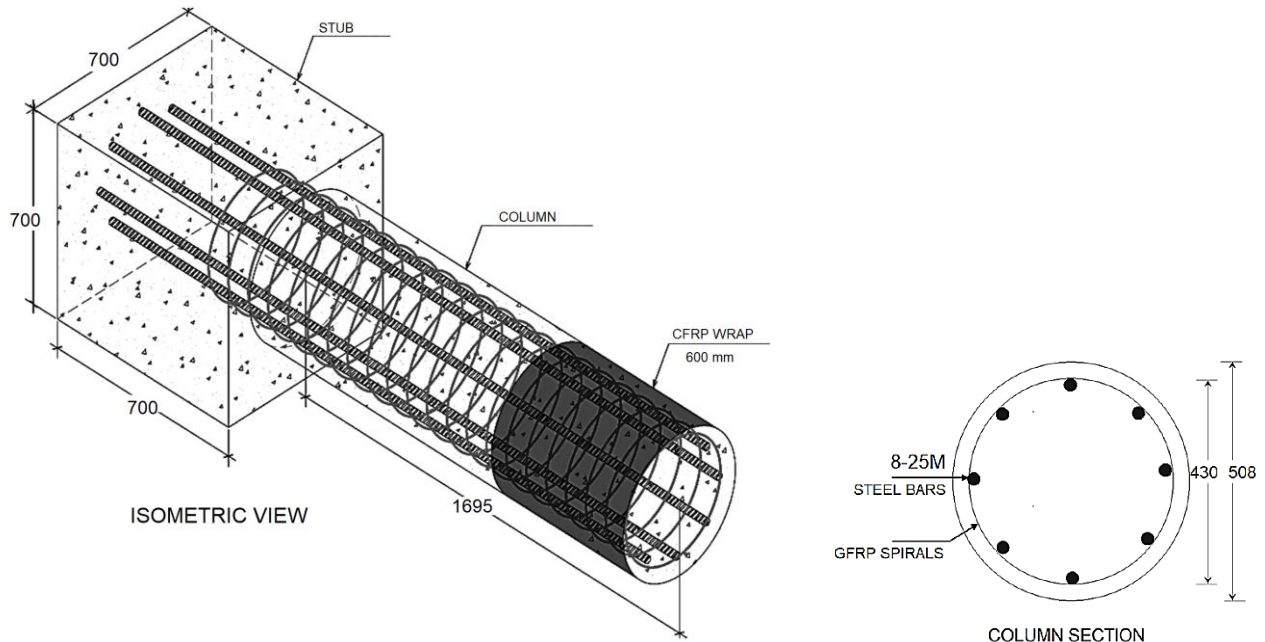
Column specimen geometry (all dimensions are in mm)
